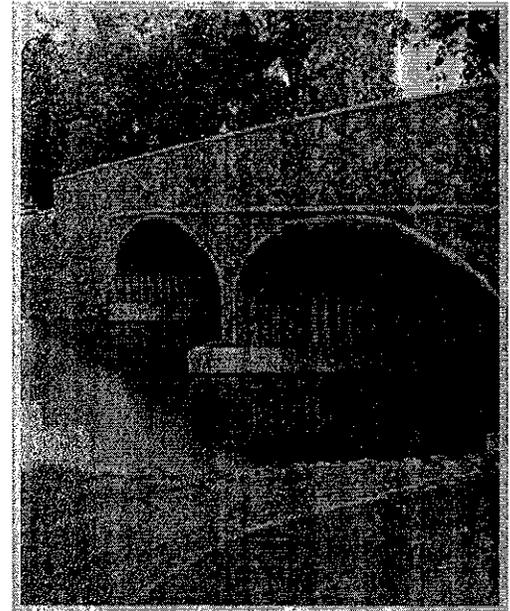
EXAMPLE OF A ROCK FACADE ON A PIPE ARCH BRIDGE
